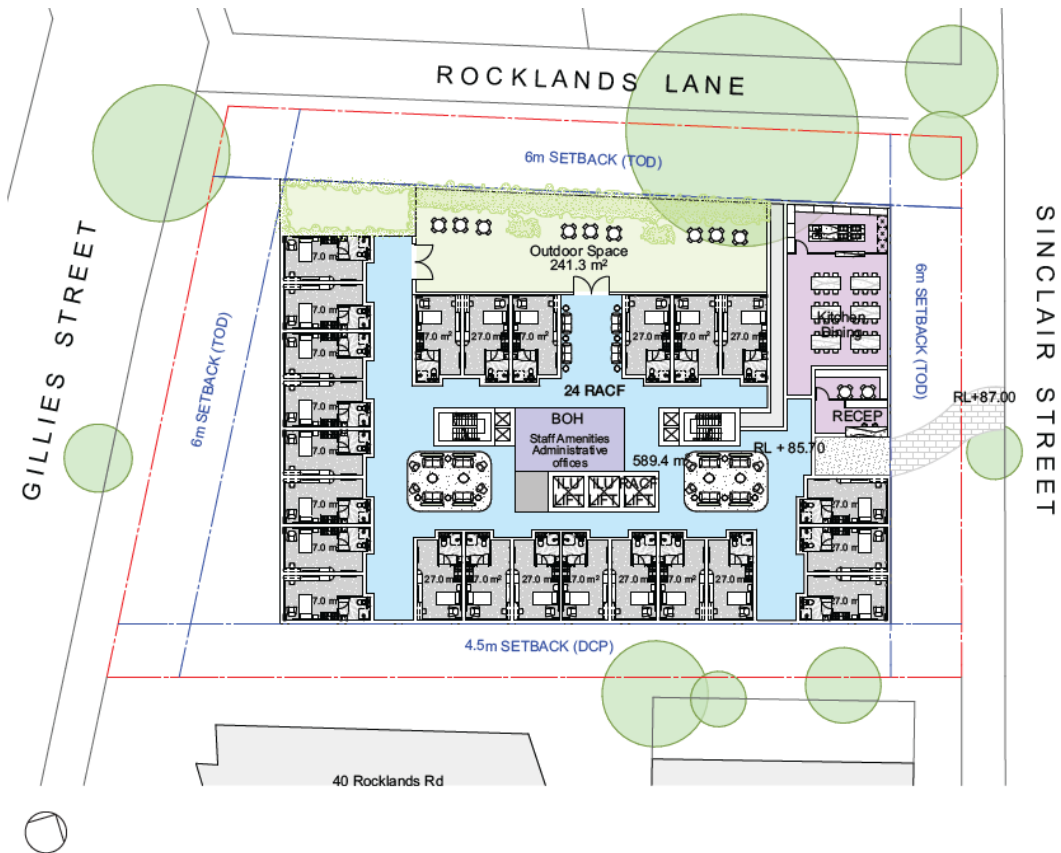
Sinclair Street - Level 1 (DKO Architecture)
